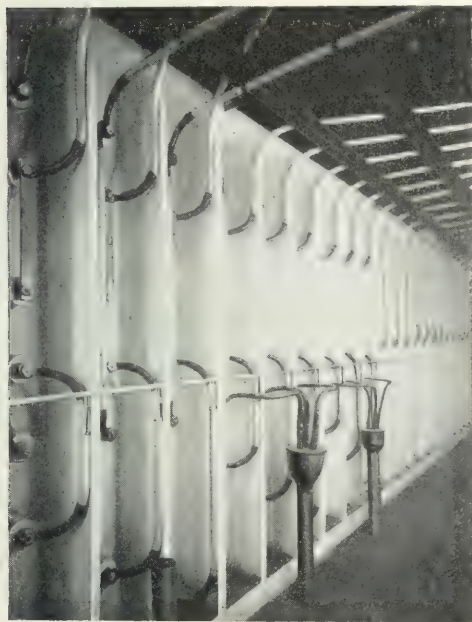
CONCRETE STRUCTURE AND CONNECTIONS
